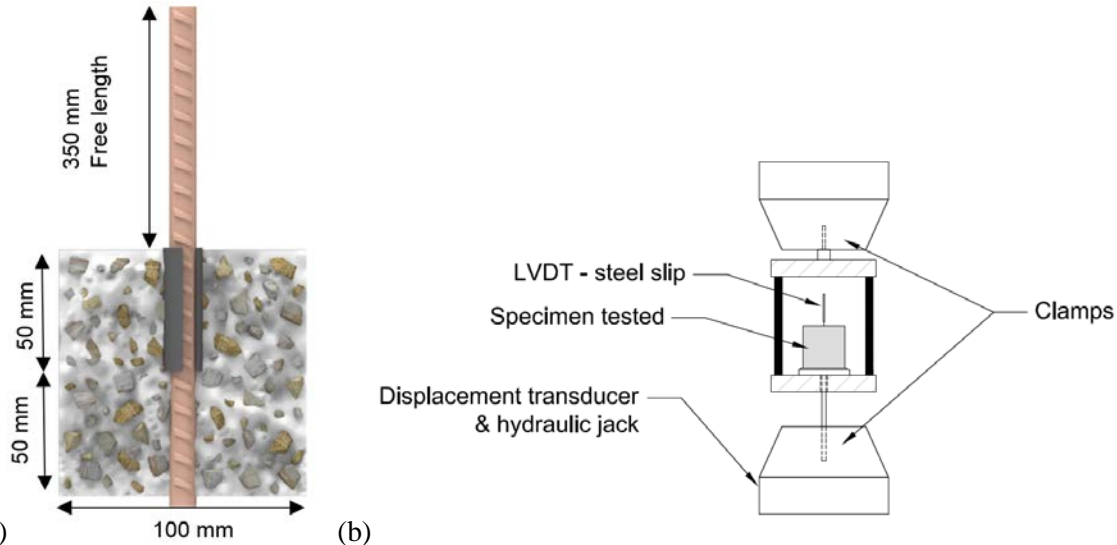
(a) Concrete specimen description (phase 1) (b) Test setup, direct pull-out test
